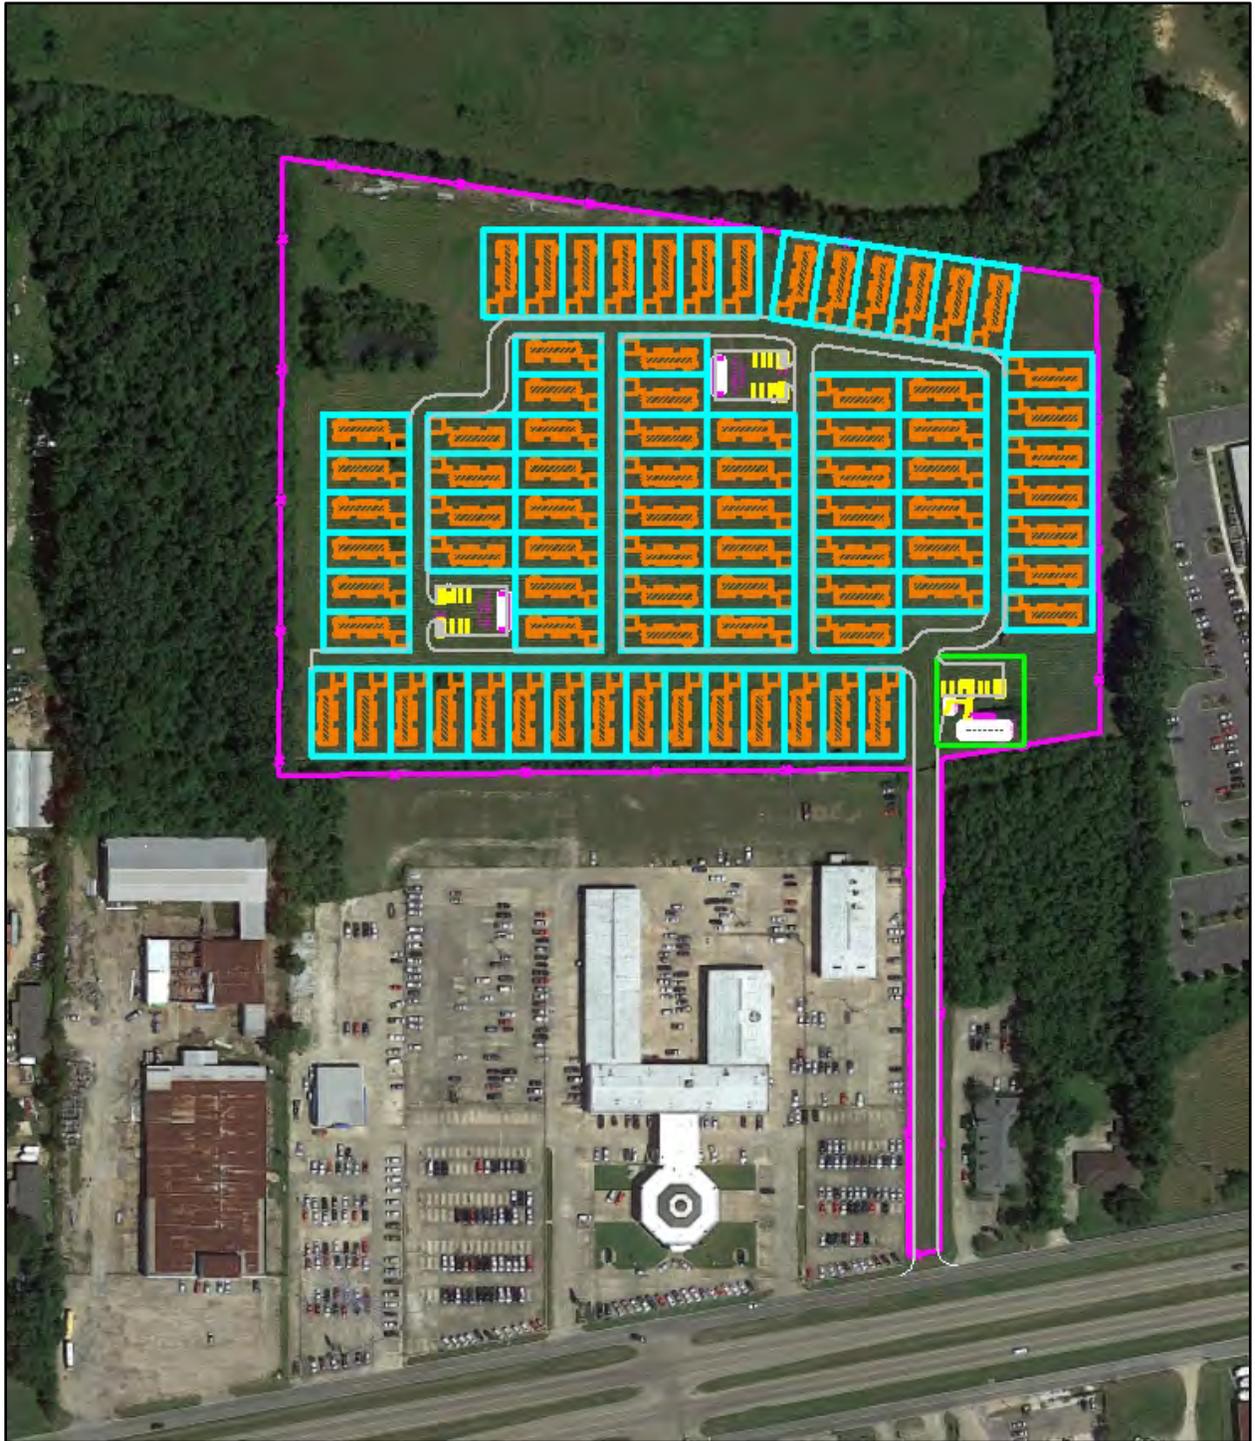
Florida Chevy Group Site Proposed Layout (Google Earth)
